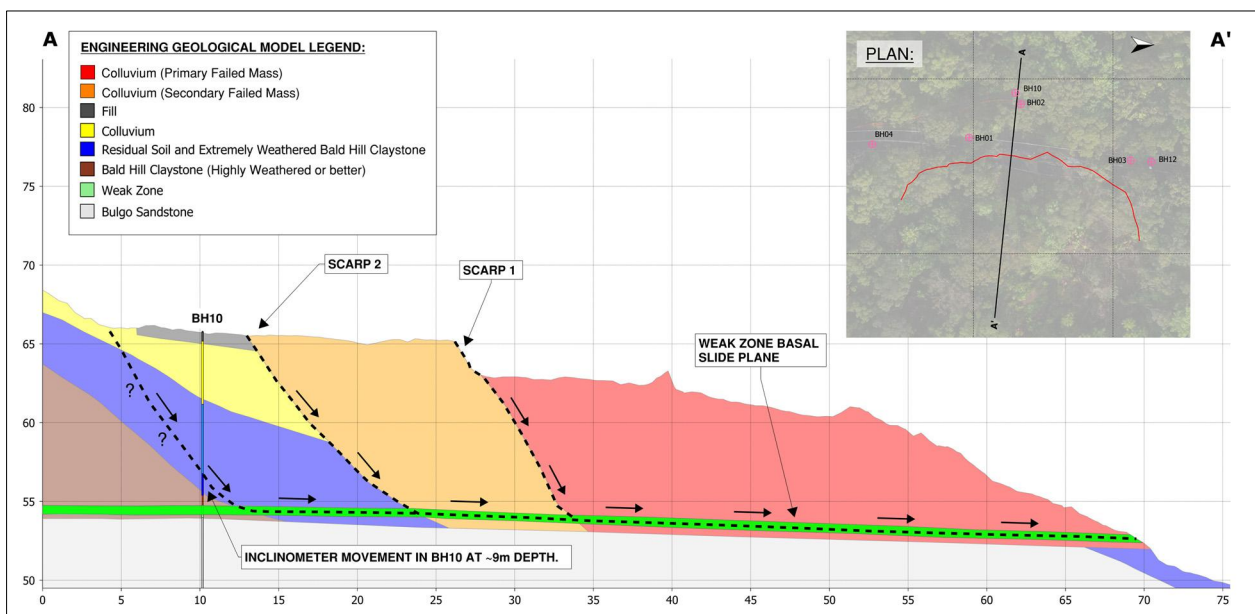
Cross section A-A' through the EGM displaying the assessed mechanism of landsliding at Garie Road.
